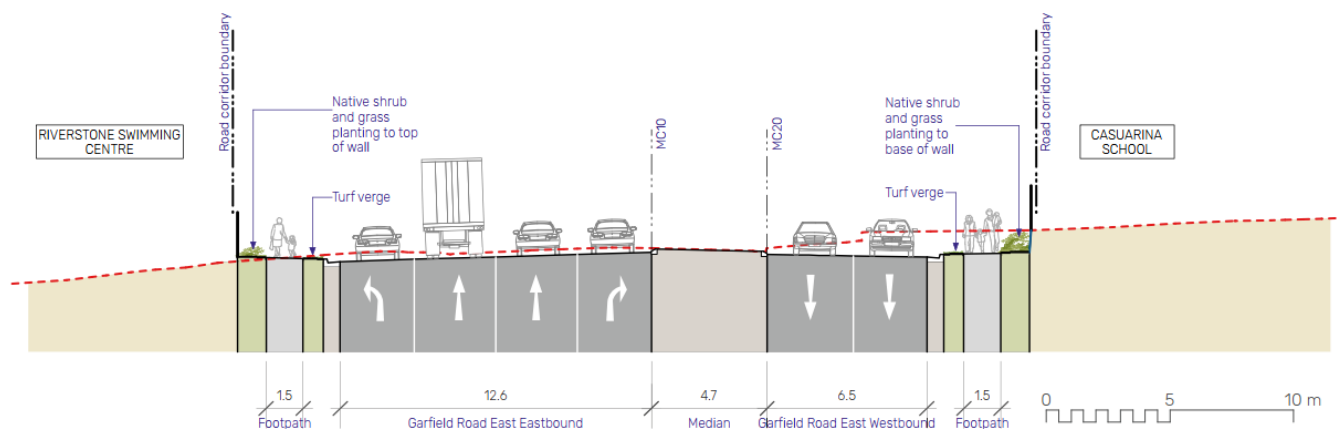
Typical cross-sections of the proposed Garfield Road East at change 600 (source: SMM, 2020)
